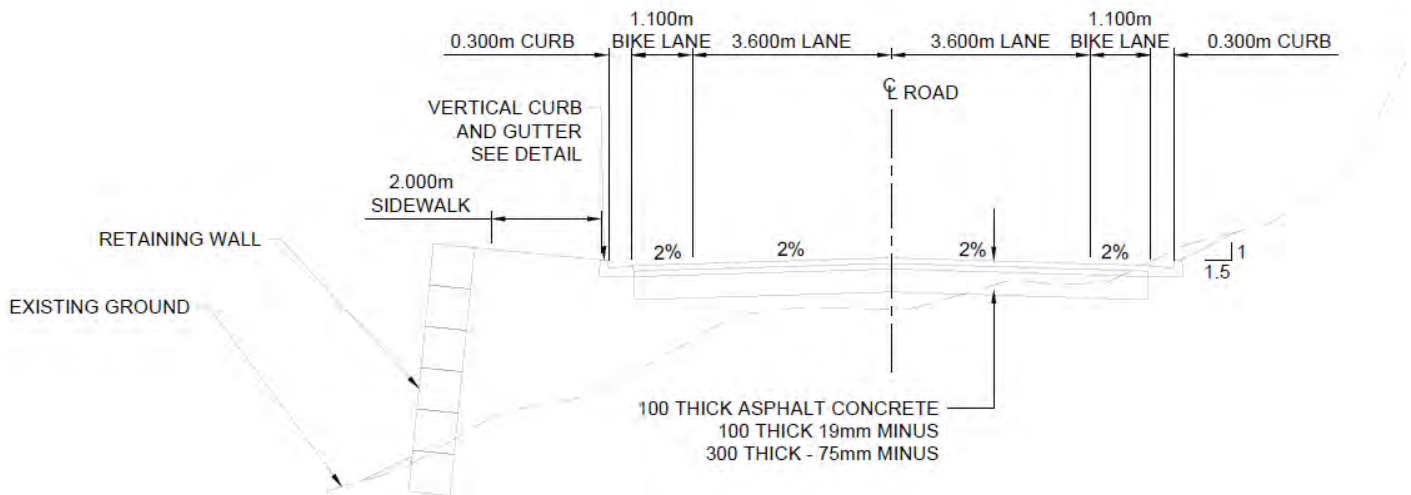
Proposed 10 metre Cross Section, Lanfeear Drive
